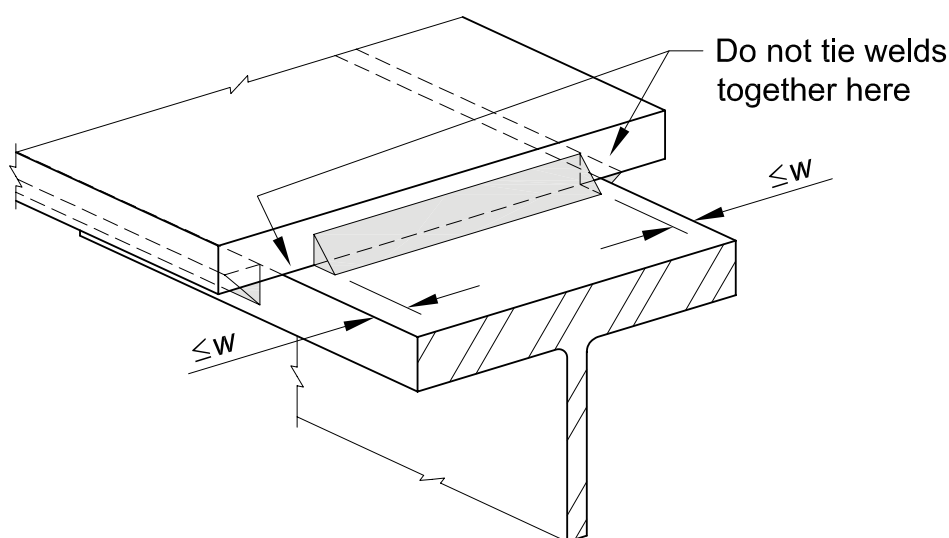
Details for fillet welds that occur on opposite sides of a common plane.
